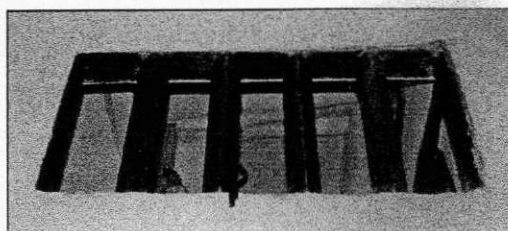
(left): First floor landing of stair tower, showing store and window onto stair lobby
